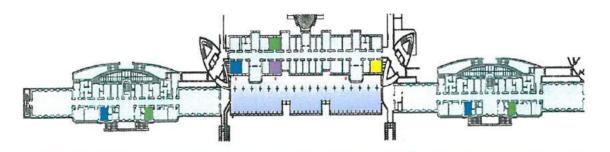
Plan of the east-west running terrace showing the additional greenhouse (centre)
